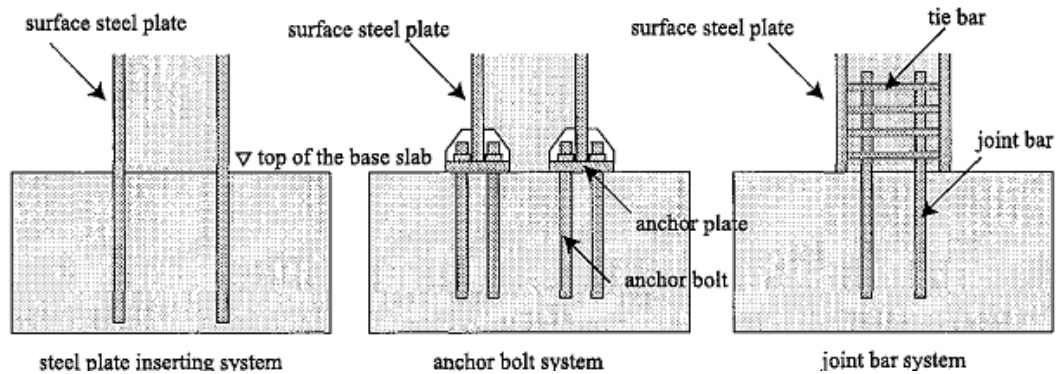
Joint system types used in steel-concrete-steel composite walls (Tsuda *et al.* 2001)
